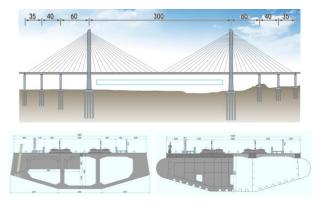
Representative HSR cable-stayed bridge with ballastless track (photo from China Railway Siyuan Survey and Design Group CO., LTD.)
